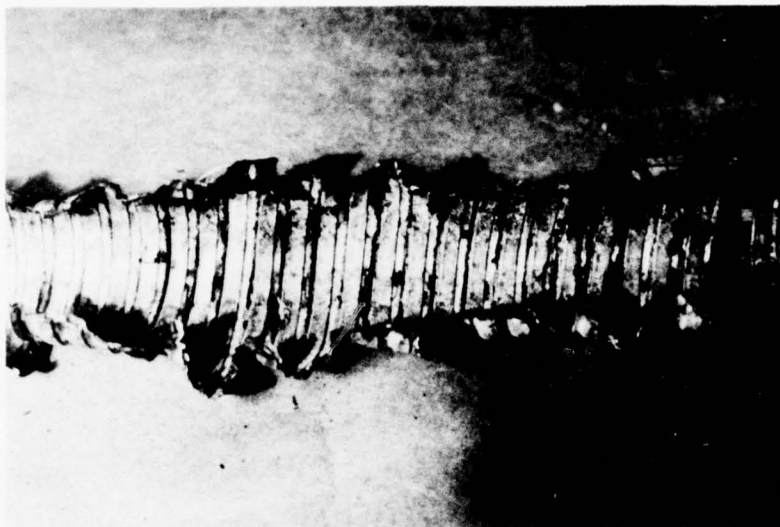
Inside of midsection of conduit in beam 6. Note rust on joints heavier and unrusted surface less lustrous than at ends (Photo 48)
